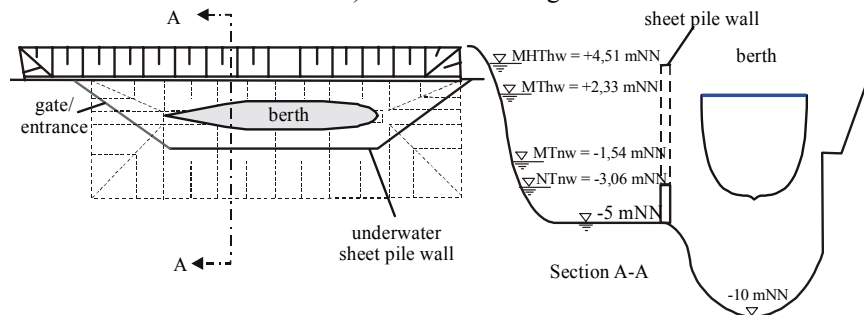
Sheet pile wall dimensions, ship position and mean water levels.
